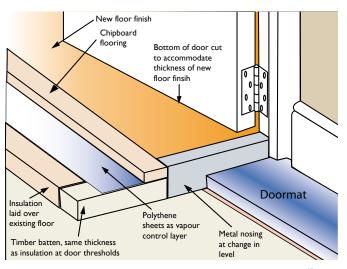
Incorporating a well in insulation above a concrete floor¹⁵
